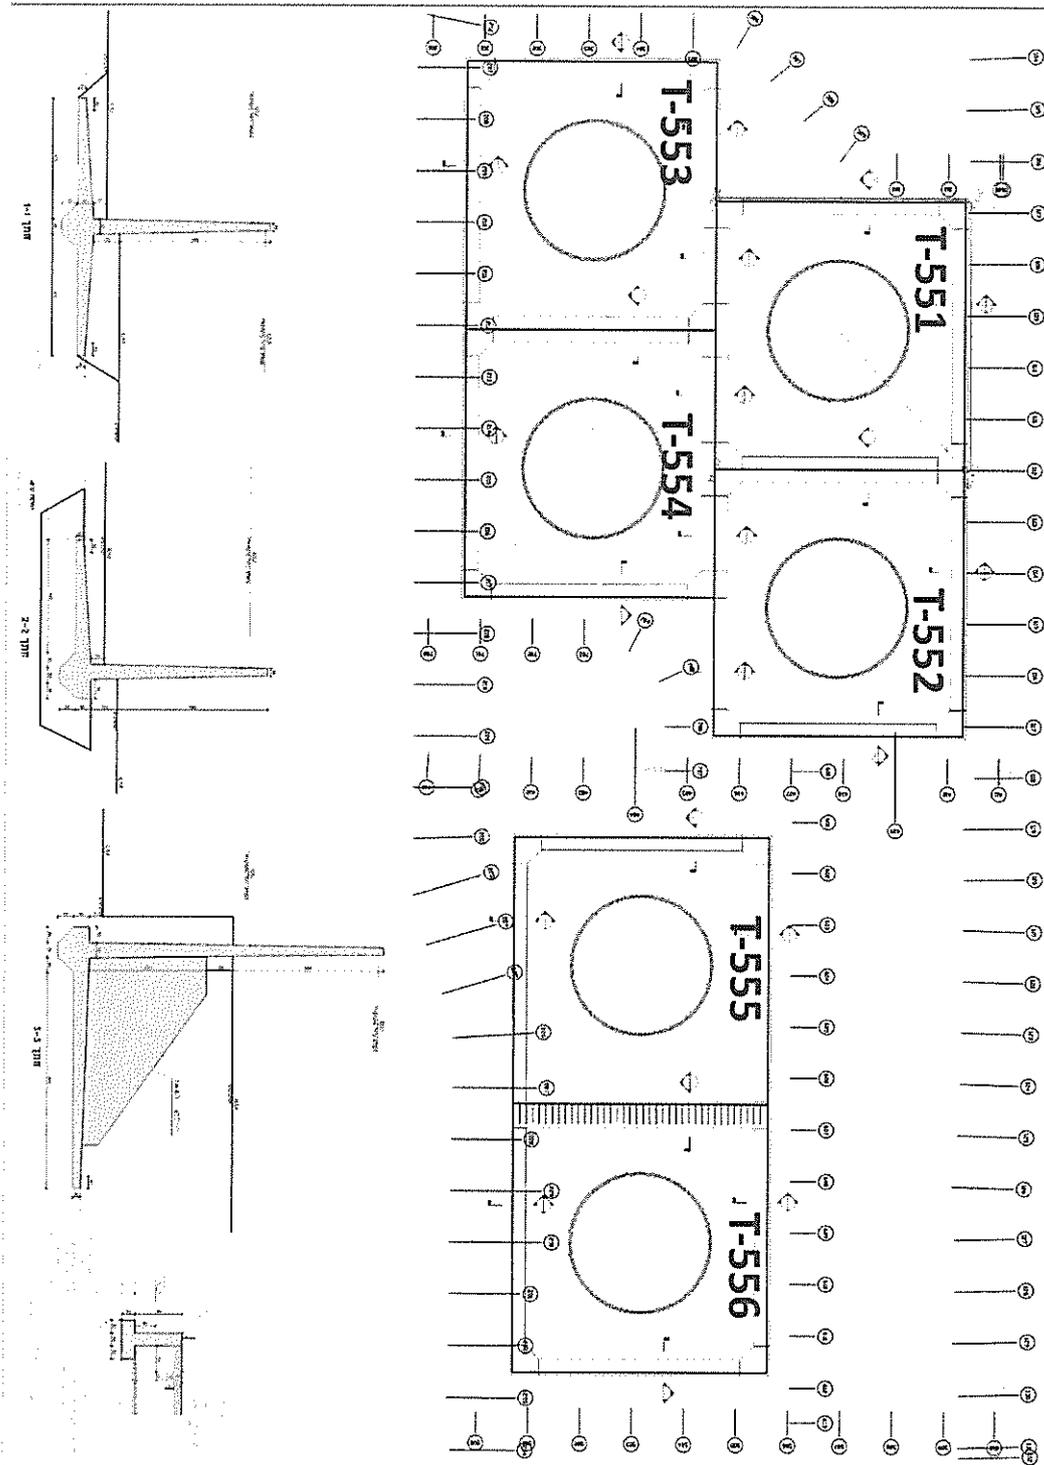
General plan of the wall of the containment and cross-sections of the walls.
